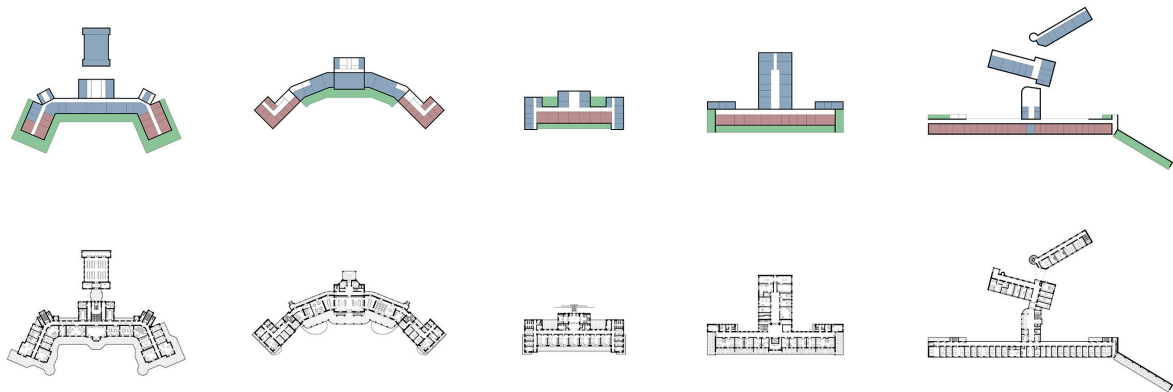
Planimetric reconstruction of the Paimio sanatorium, drawing by the author;
